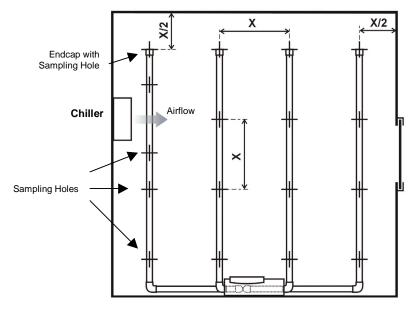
Grid Layout for Sampling Hole Locations (X = sampling hole distance – refer to relevant standard)
